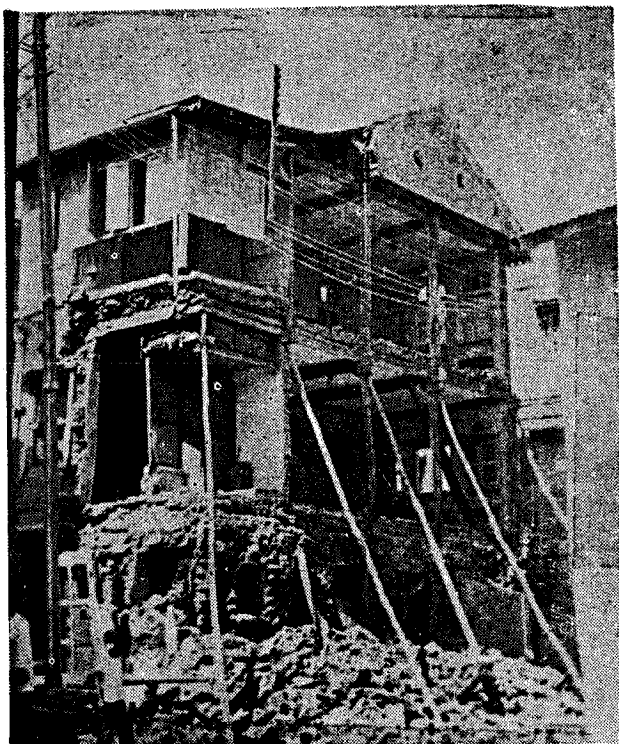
Failure of filler walls due to improper connections at Worwad, Broach.
